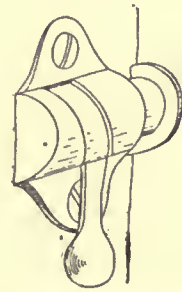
Sash-fastener. Stoddard Lock & Mfg. Co.
